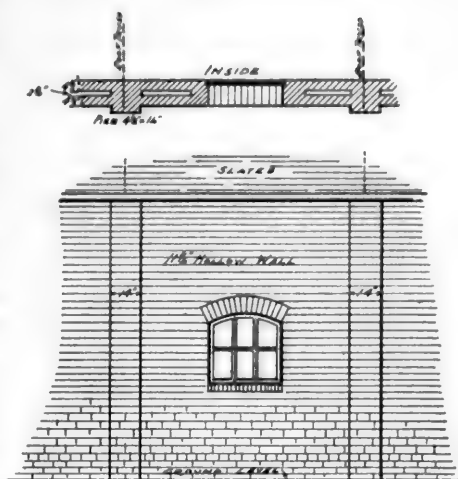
Plan and elevation of a 12 inch thick hollow brick wall with piers outside and occurring at each roof truss.
